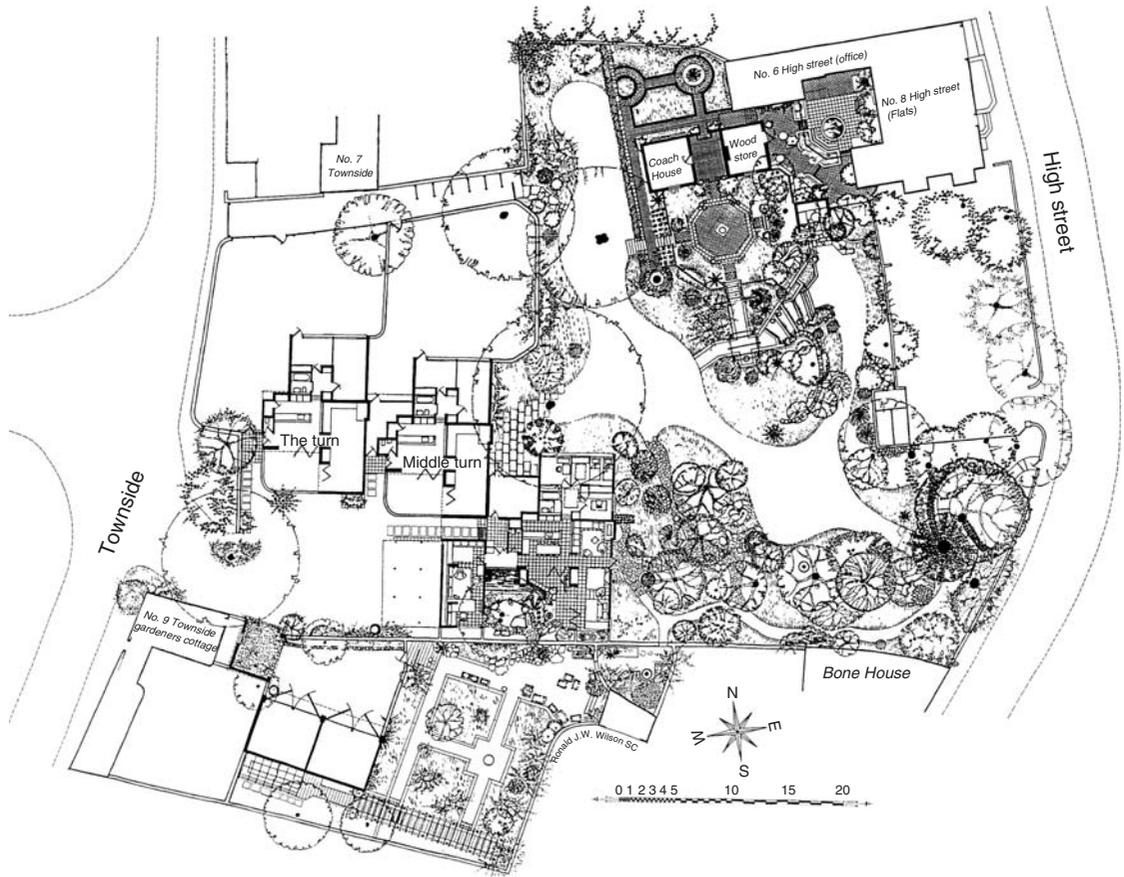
Turn End: plan of the houses and Peter Aldington's garden.
